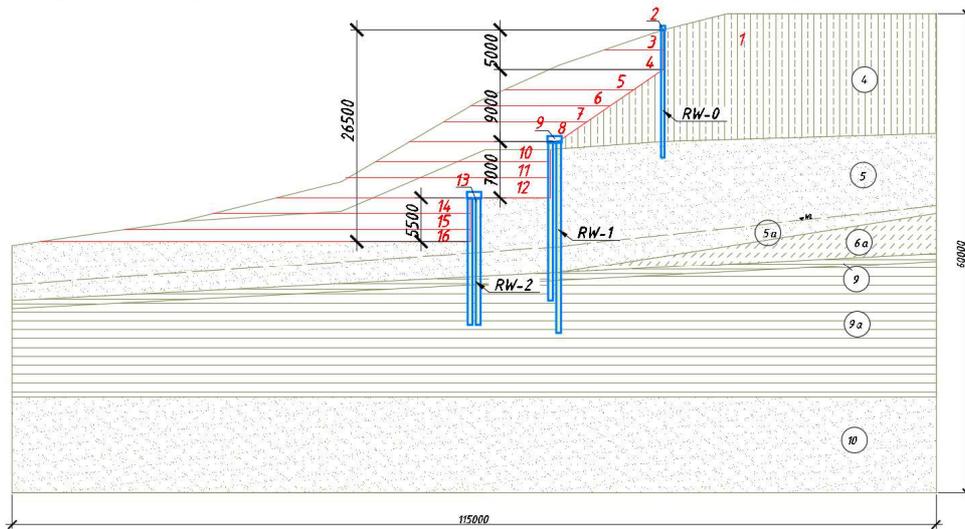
Scheme of location of retaining walls and stages of excavation pit
